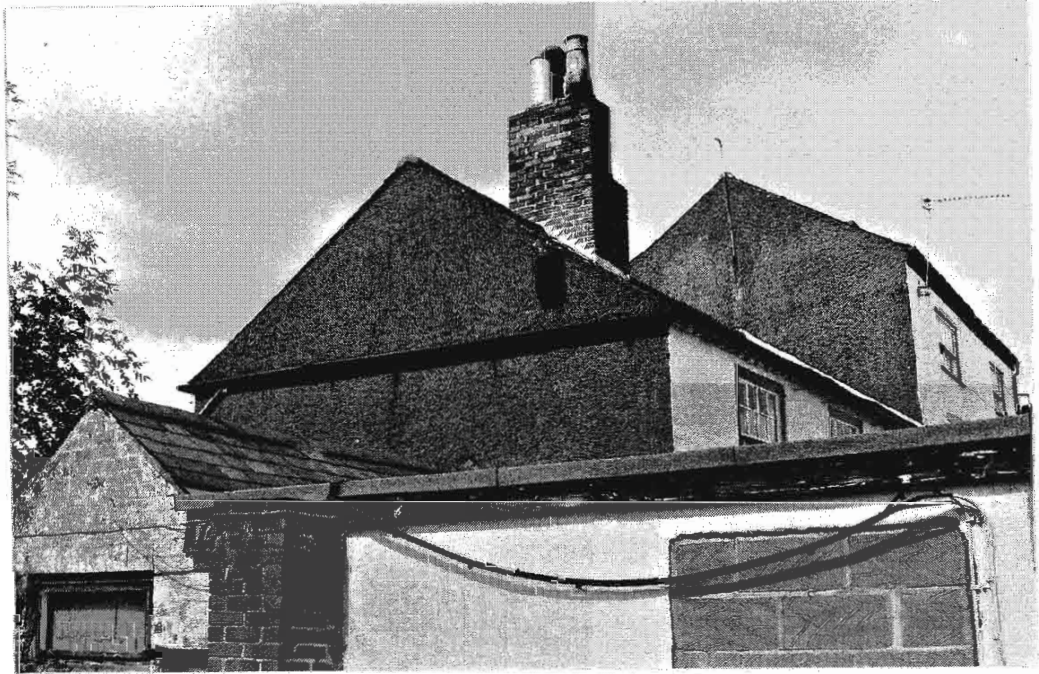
Detail of 19<sup>th</sup> century building's west elevation, showing three-over-three paned, sash window at second floor and segmental arched window at first floor. Also shows Flemish garden Wall Bond of this elevation. The gable palimpsest, part of which can be seen in this photograph appears to be part of a now demolished building shown on early Ordnance Survey maps.
